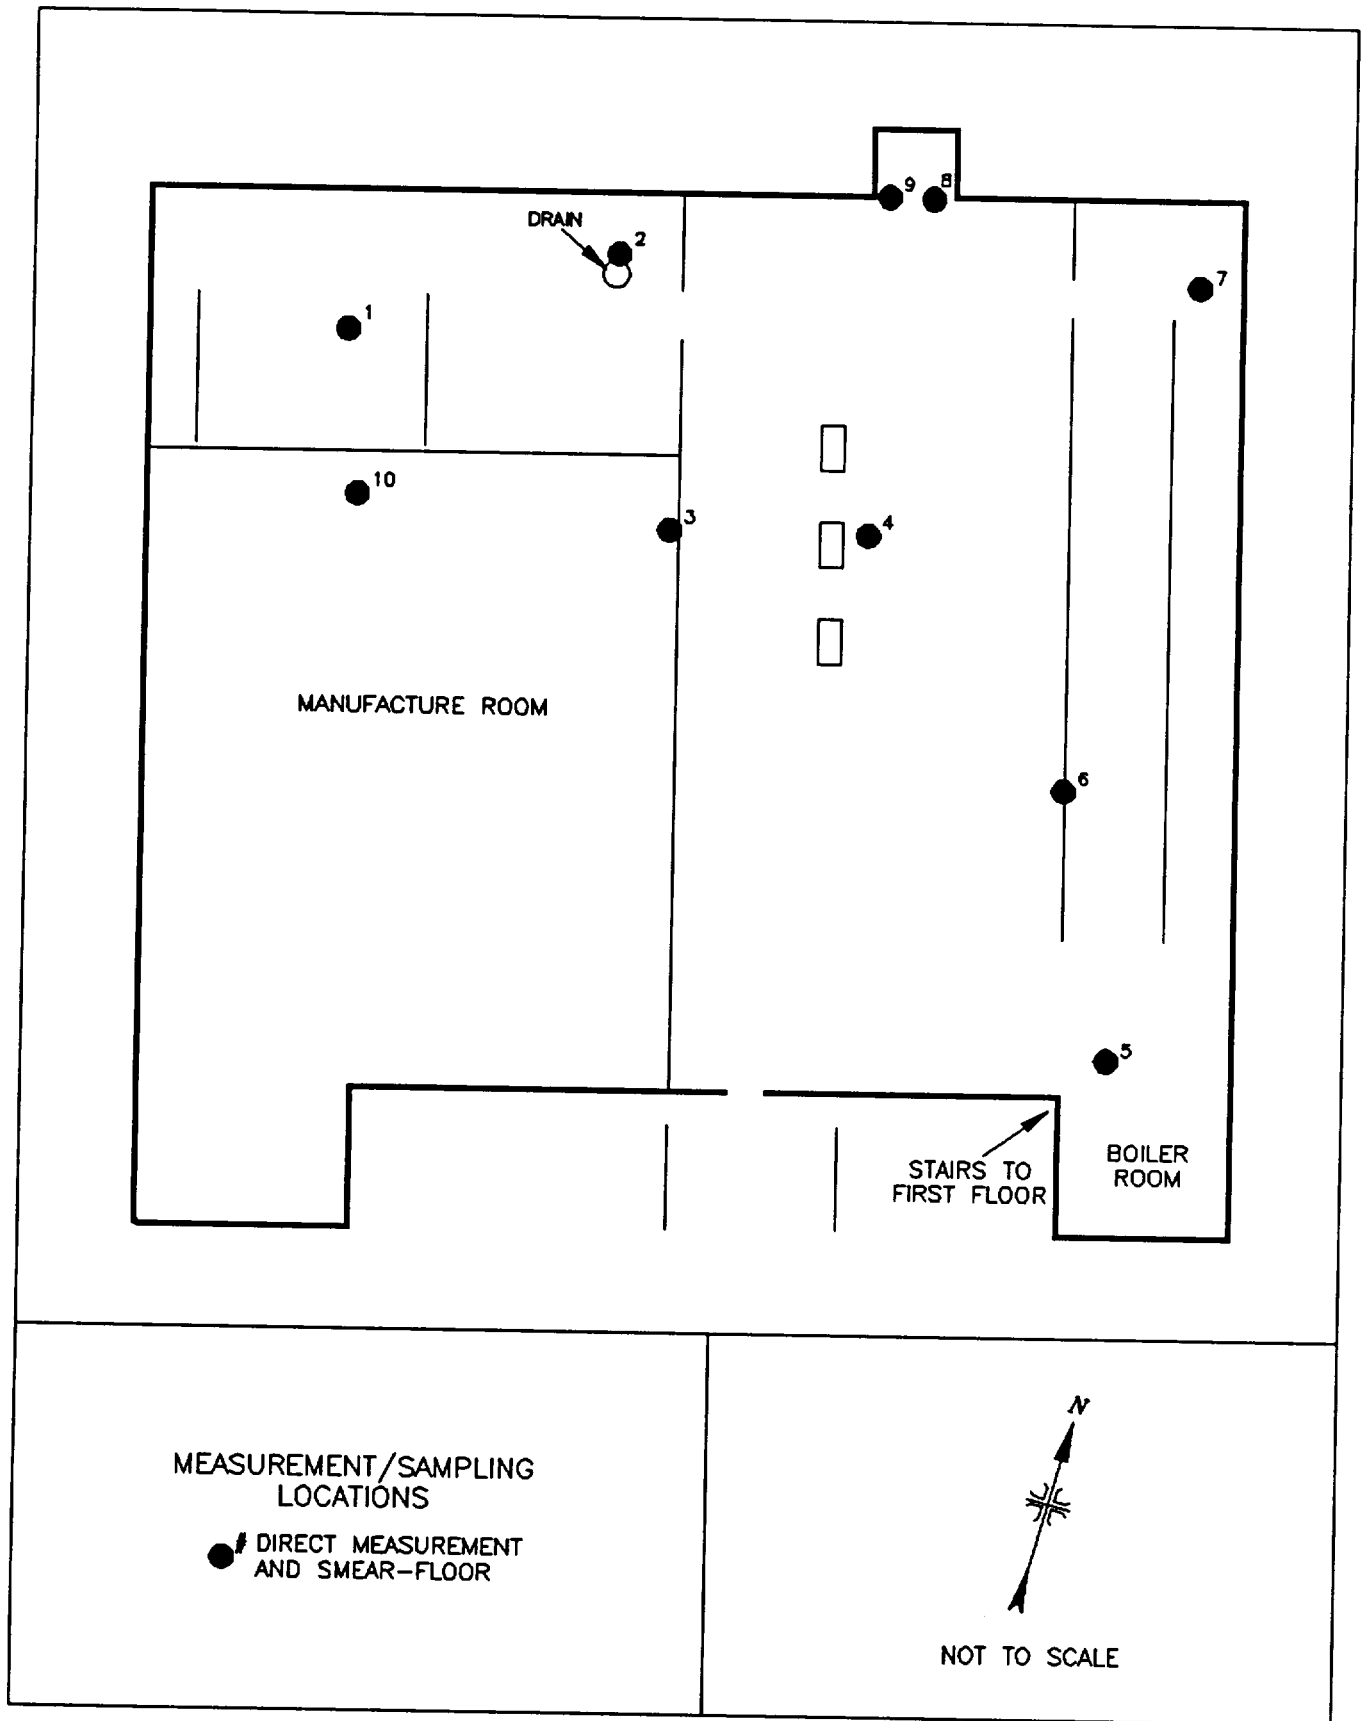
Building 8, Basement – Measurement and Sampling Locations
